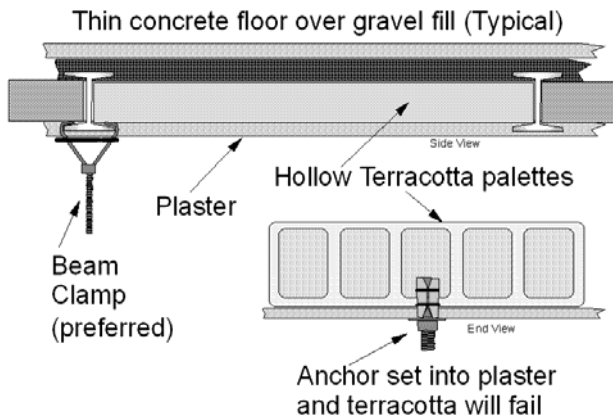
Tile Arch buildings require beam clamps or other arrangement. Anchors set into plaster or terracotta are prone to catastrophic failure.
